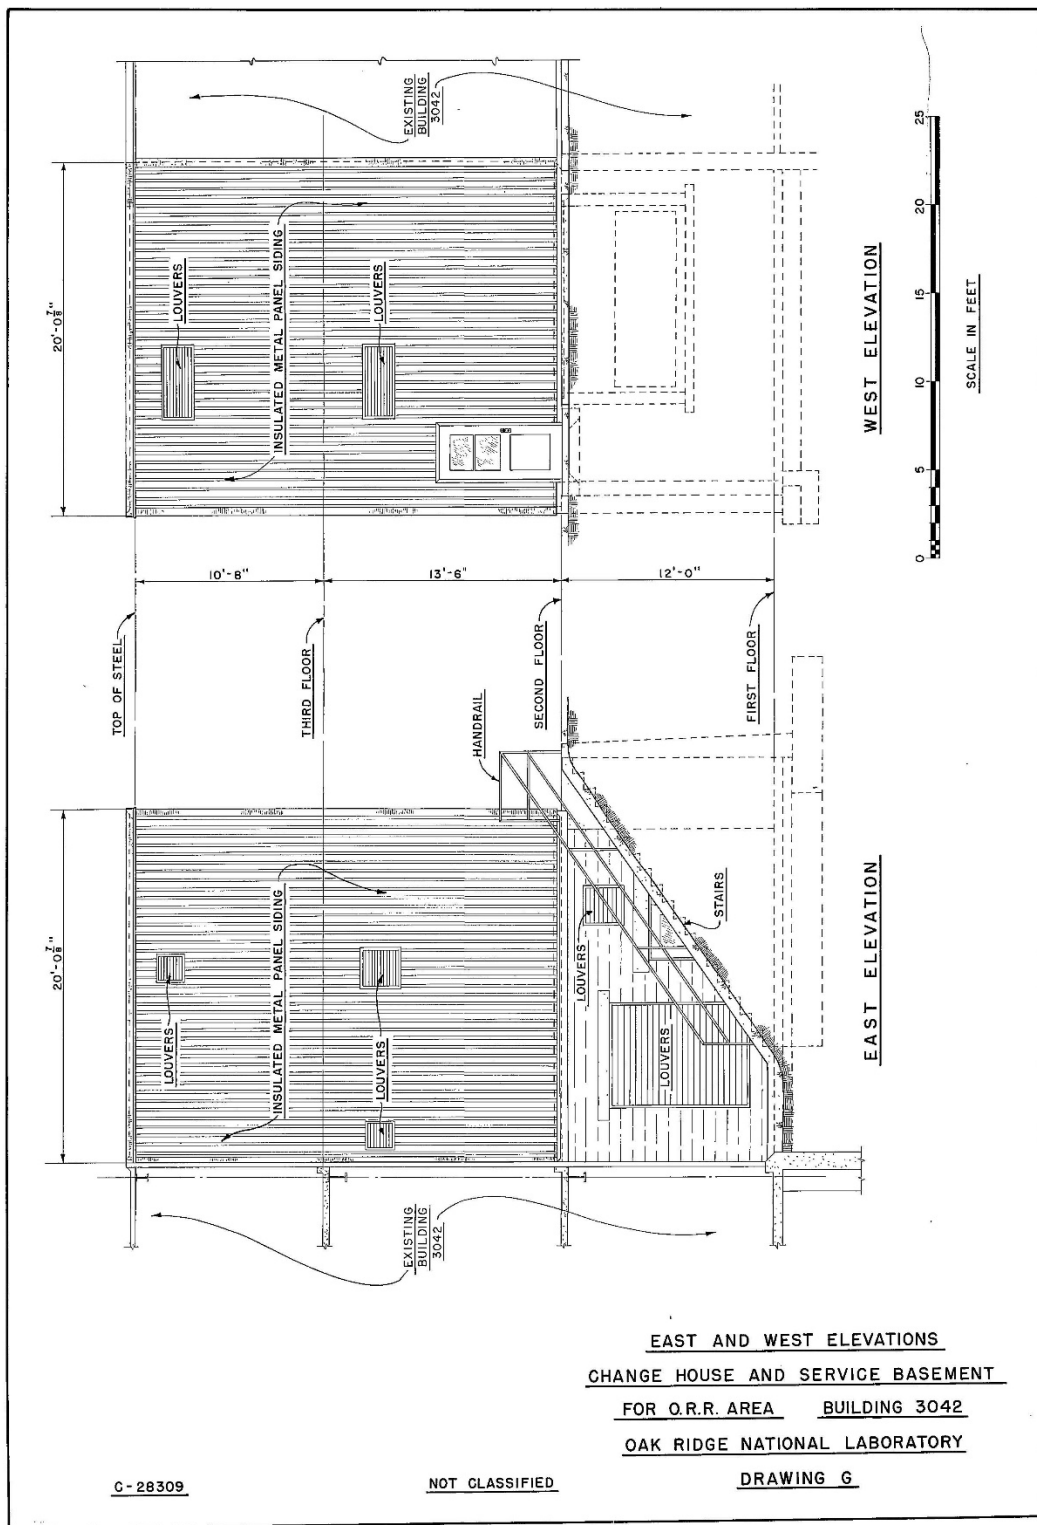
East and west elevations of the circa 1957 Change House and Service Basement addition to the north elevation of Building 3042 (Oak Ridge National Laboratory, n.d.).
